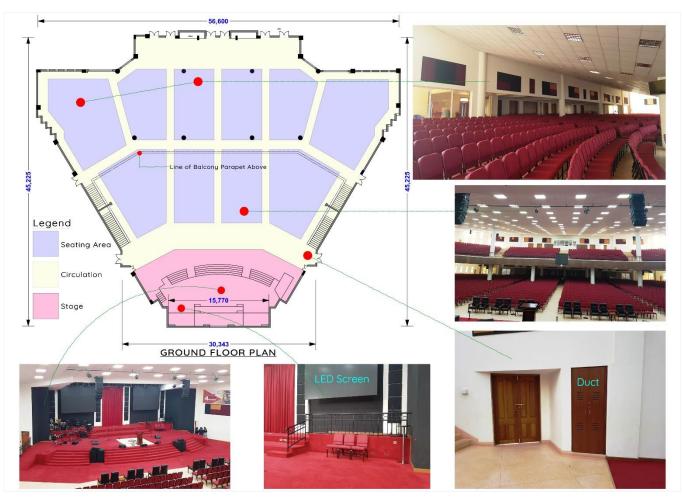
CITAM Ngong Ground Floor Plan & Internal photographs.
